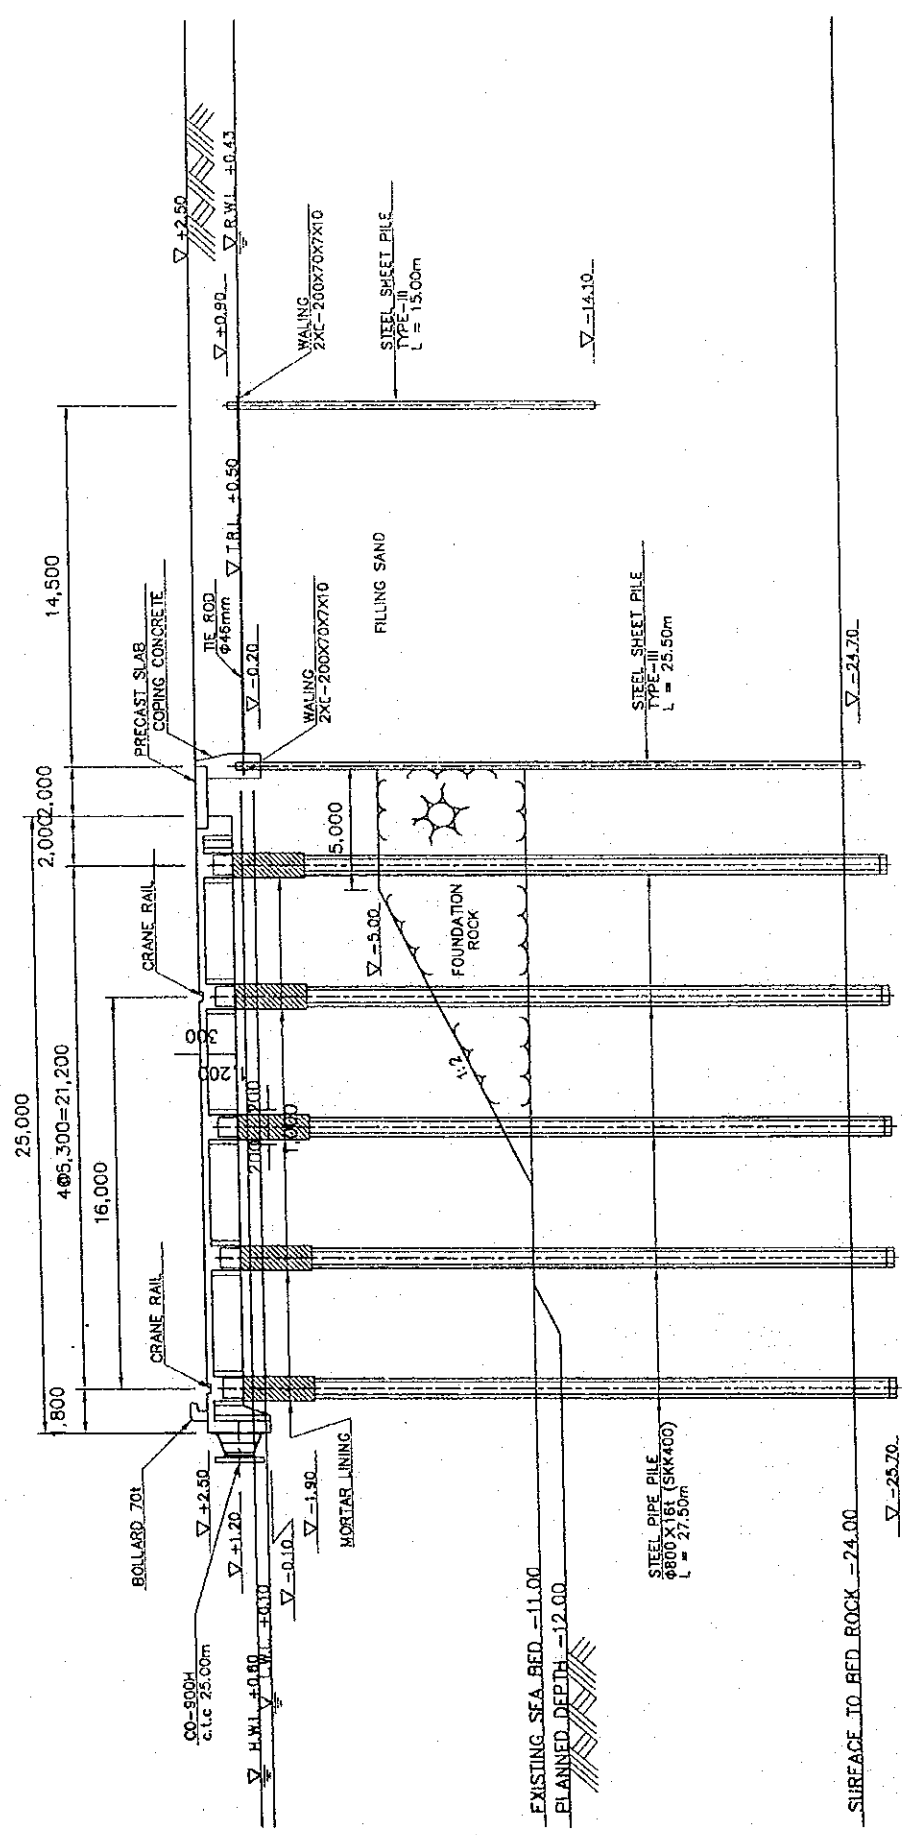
Typical Cross Section of -12.0m Quay Wall
